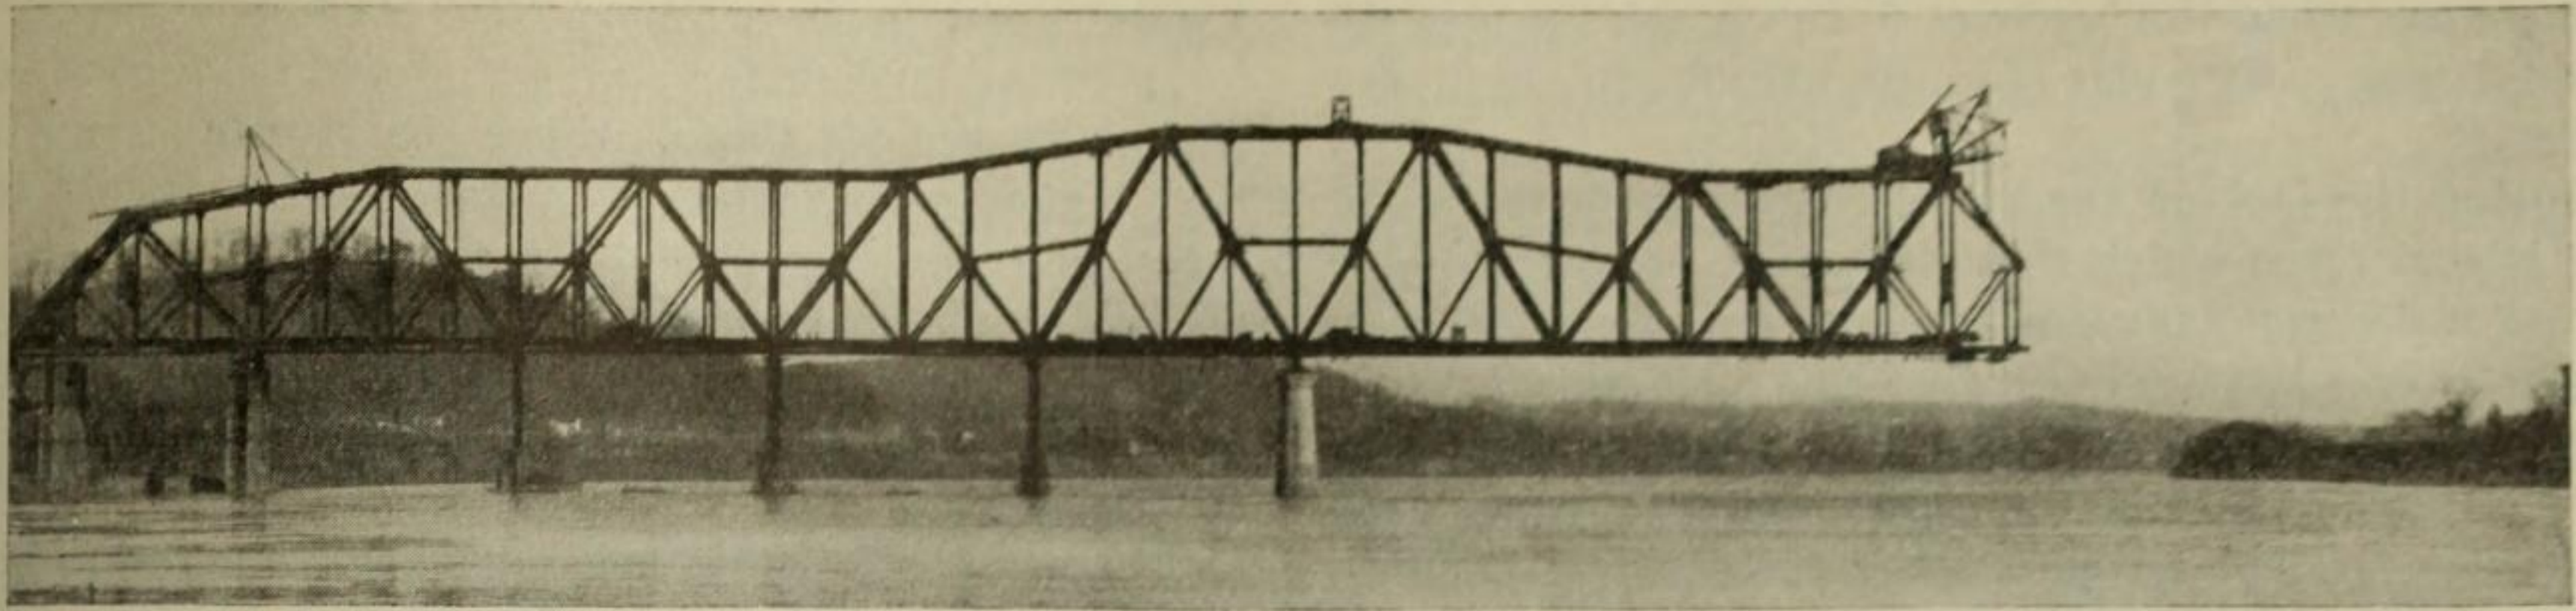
TWO BENTS SET ON TEMPORARY PIERS IN THE KENTUCKY CHANNEL SHORTENED THE CANTILEVER OVERHANG TO 465 FEET
